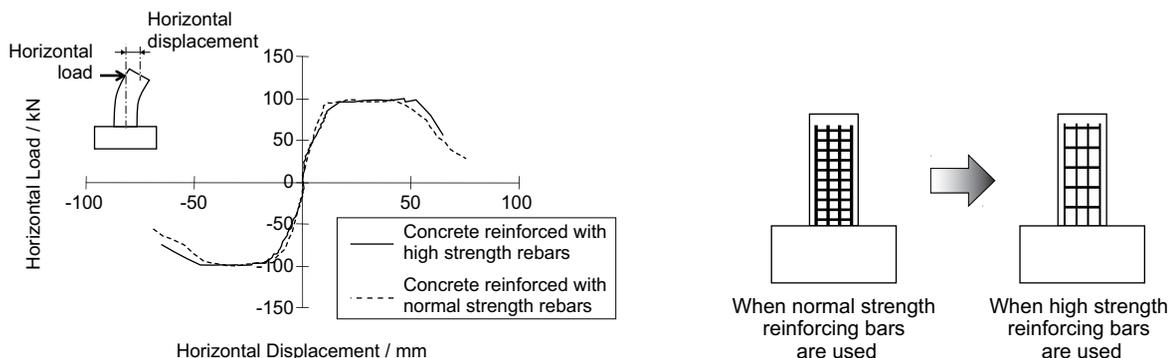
Comparison of the dynamic performance of concrete members reinforced with high and normal strength rebars. To improve the economy and the precision of casting concrete for reinforced concrete structures, Railway Technical Research Institute (RTRI) has promoted researches on the concrete reinforced with high strength rebars and found that the volume of reinforcing bars can be reduced while maintaining the dynamic performance equal to that of the concrete reinforced with normal strength rebars.
